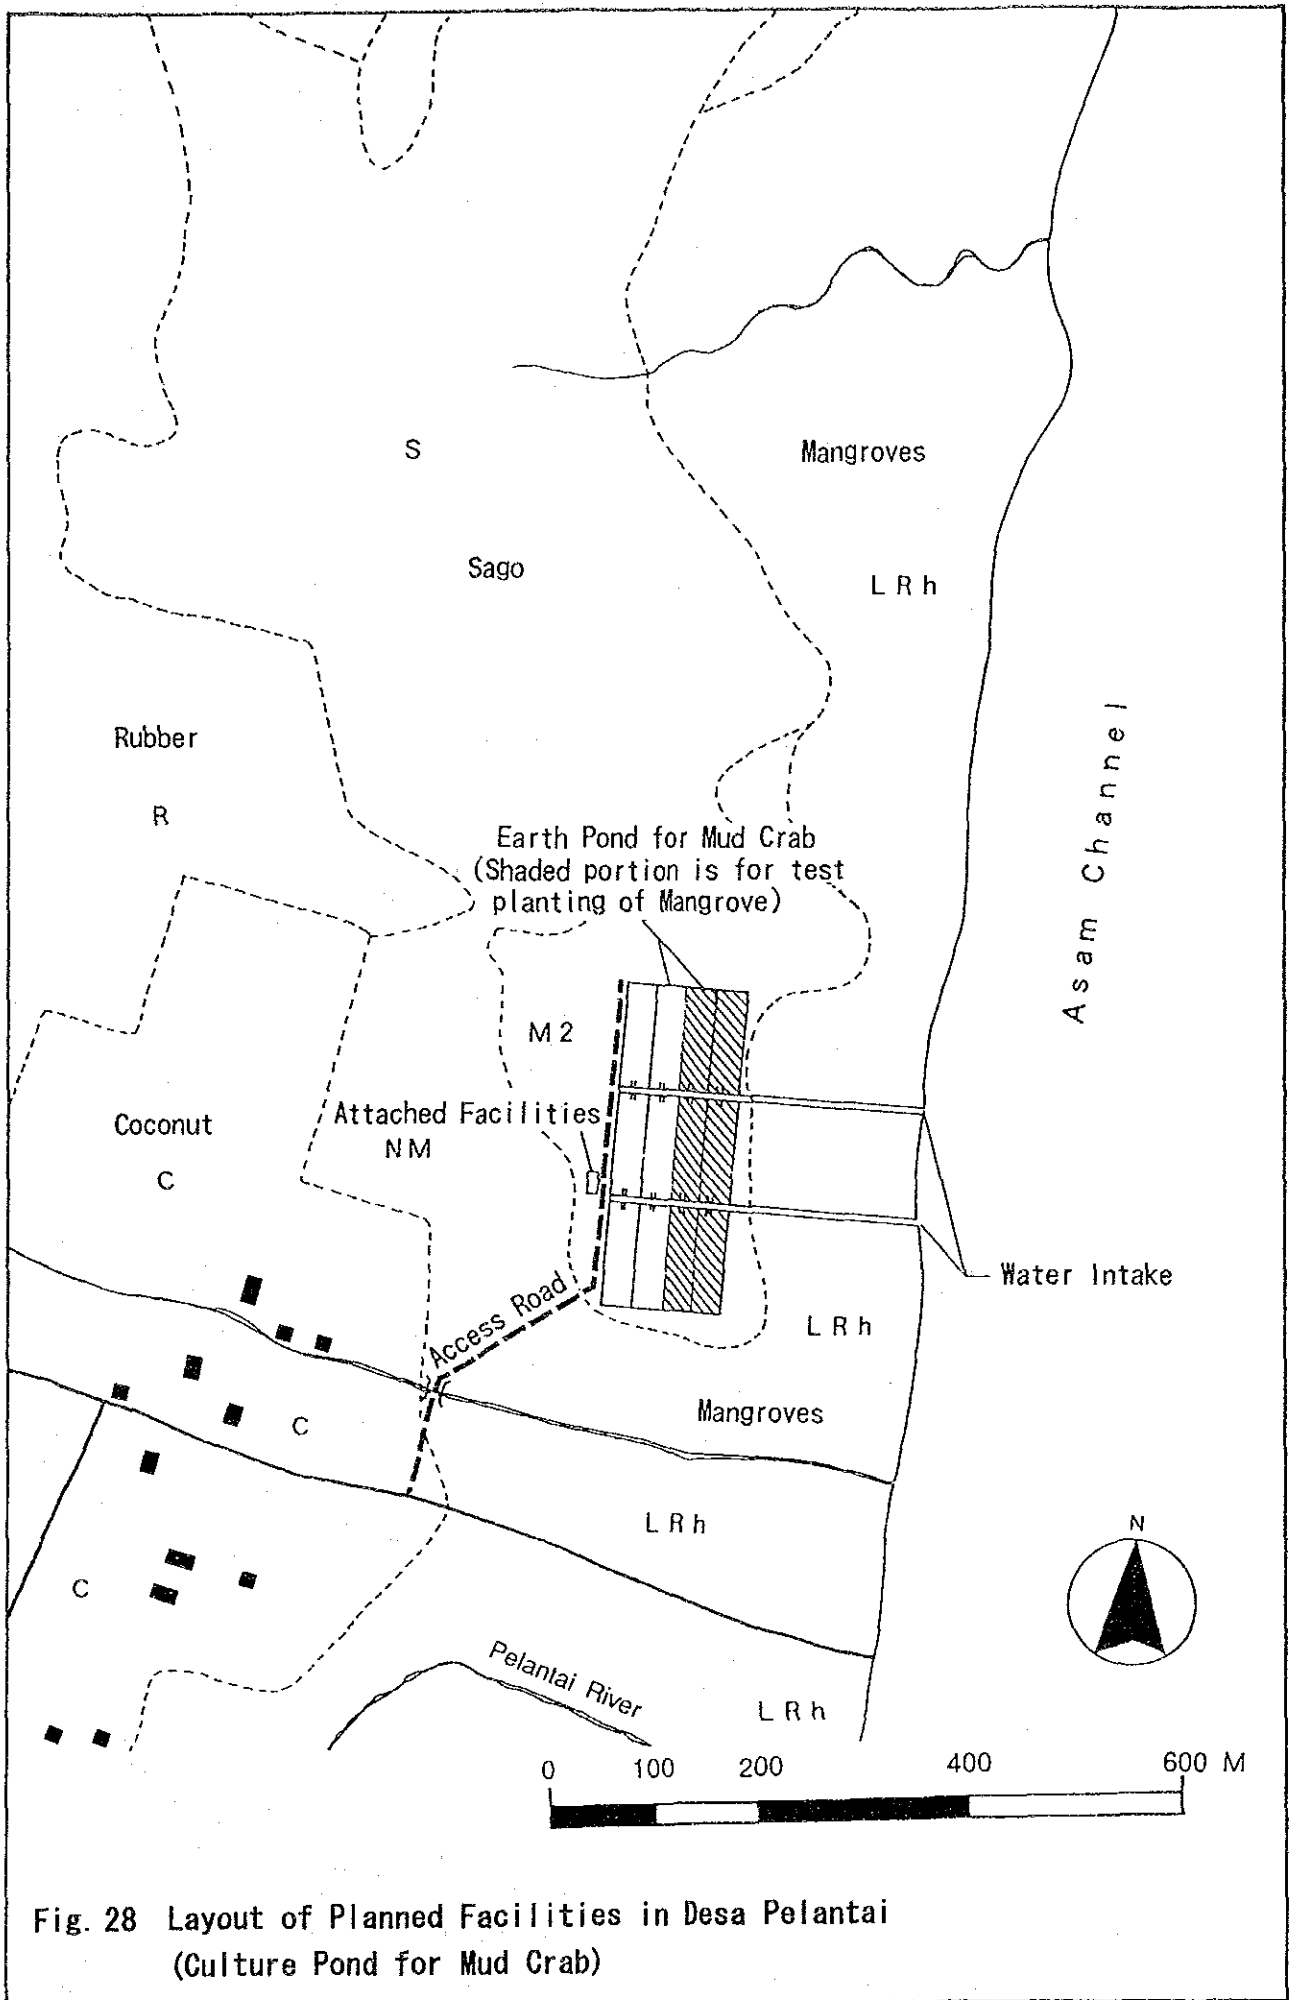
Layout of Planned Facilities in Desa Pelantai
